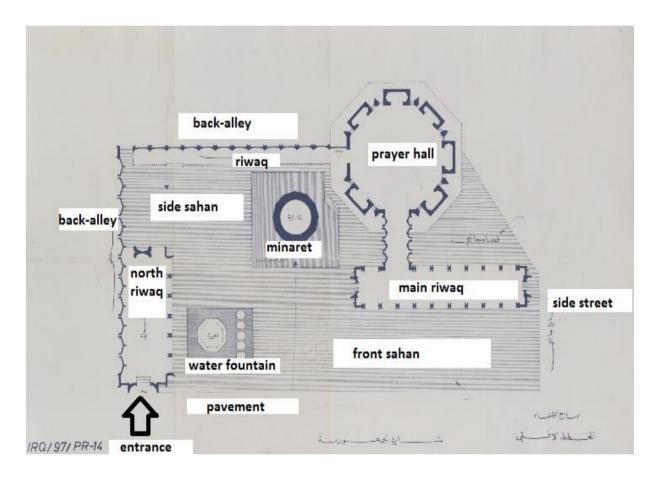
Ground floor plan of the Khulafa mosque. Source: (Aga Khan Documentation Center at MIT, Mohamed Makiya Archives). (Text added by the author.)
